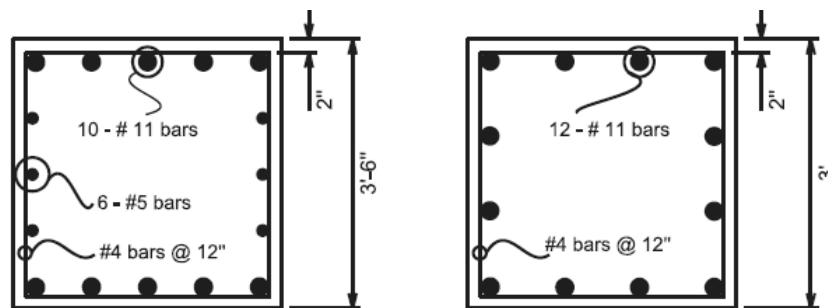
Cross-Sectional Layout for Bent Beam and Column for Multi-Span Simply Supported Concrete Girder Bridge.
